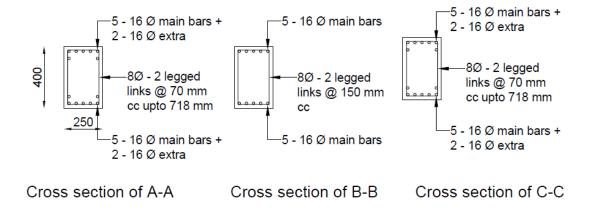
Cross sections of beams at different locations for above the ground floor
